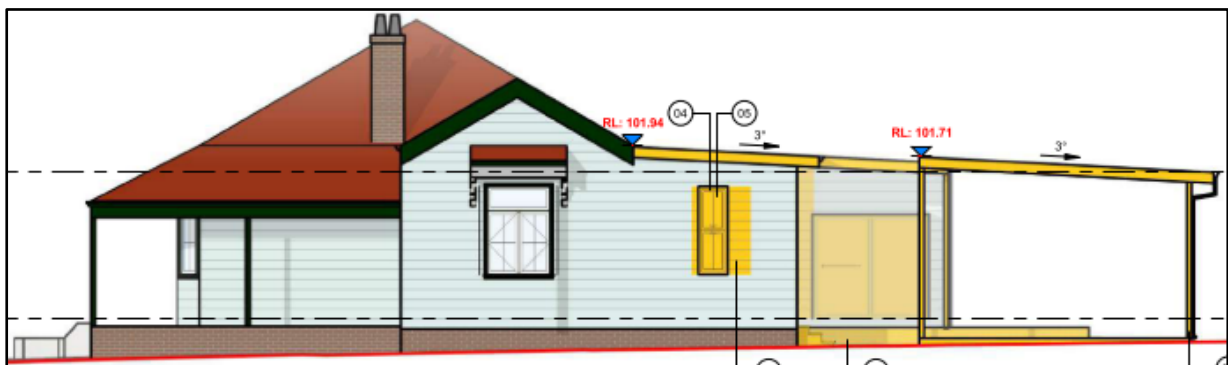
Proposed southern elevation of building on Lot 1. (extracted from the submitted plans)
